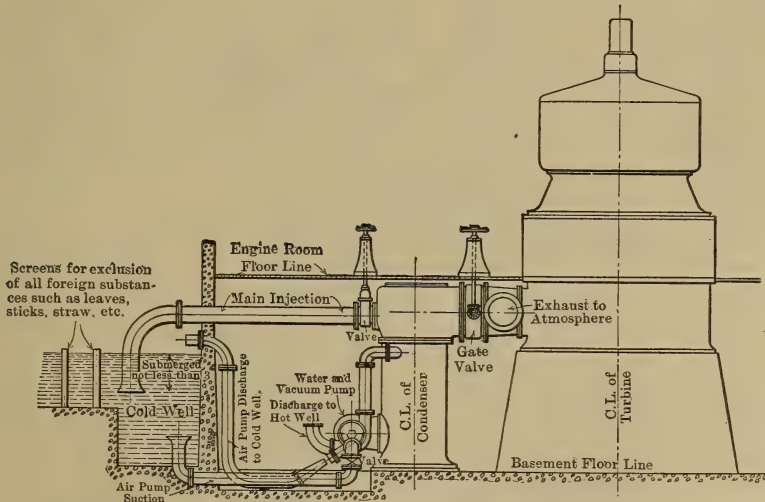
Westinghouse-Leblanc Condenser Installation Engine.
